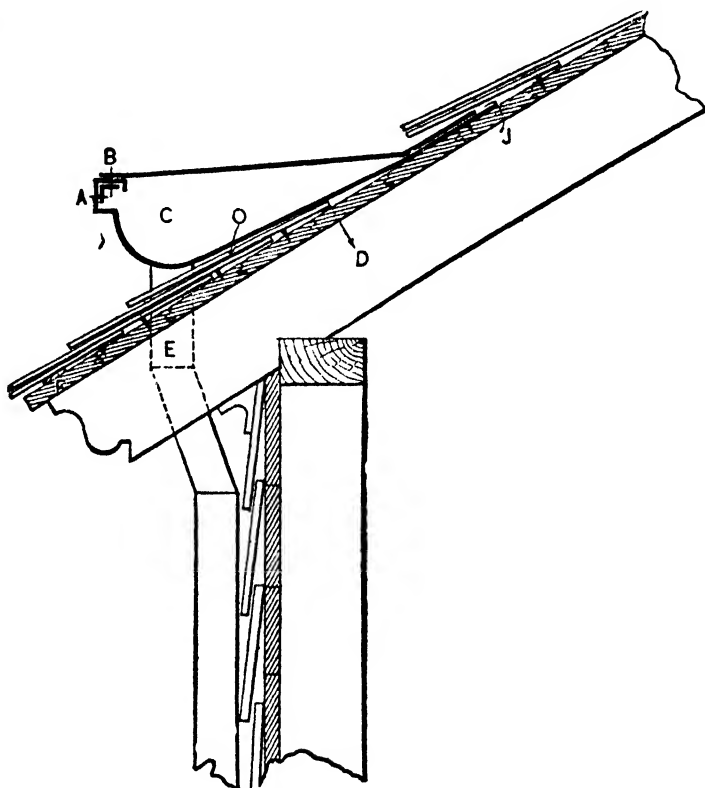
Section of Snow Guard Gutter, Showing Method of Slating
